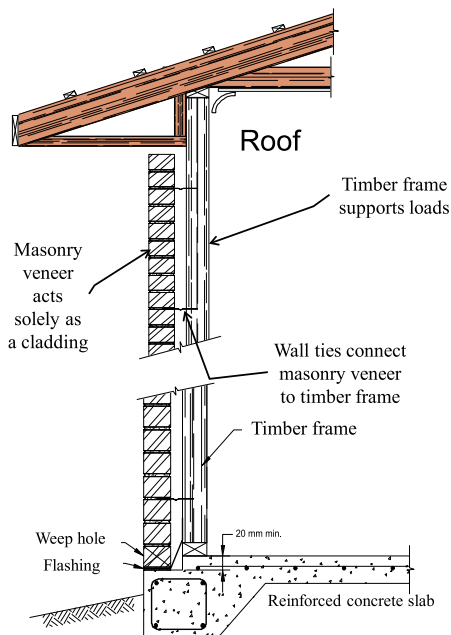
Masonry veneer wall details with flexible backup system (Think Brick Australia).
